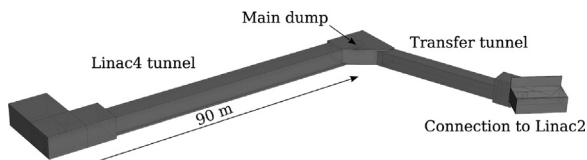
Layout of the LINAC4 underground tunnel complex.
